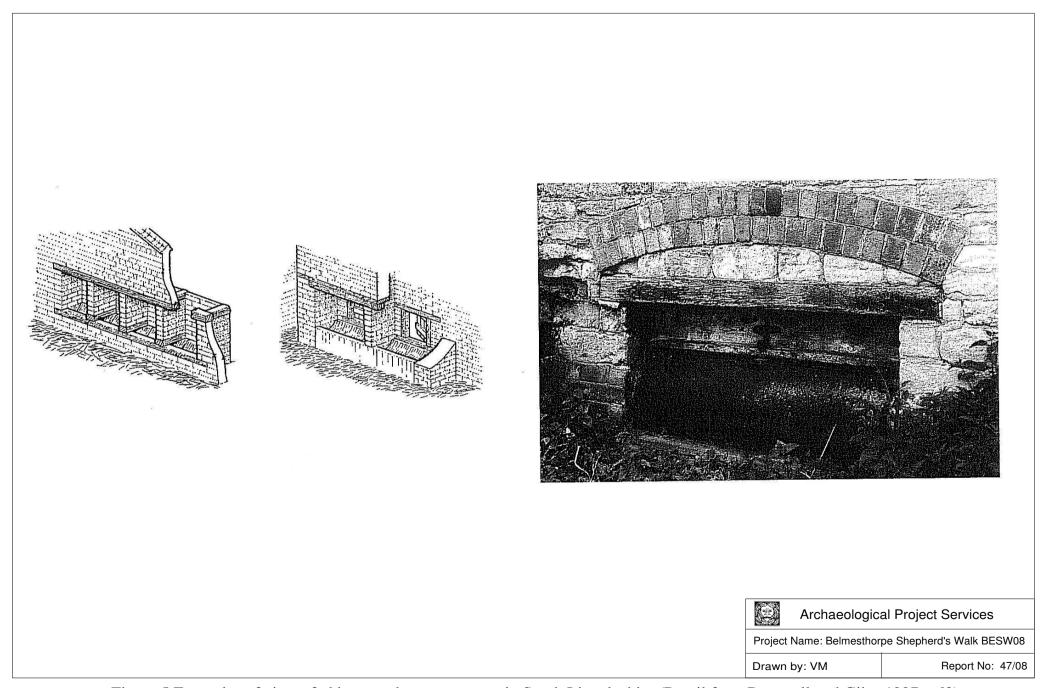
Examples of pigsty fodder trough arrangements in South Lincolnshire (Detail from Barnwell and Giles 1997, p63)
